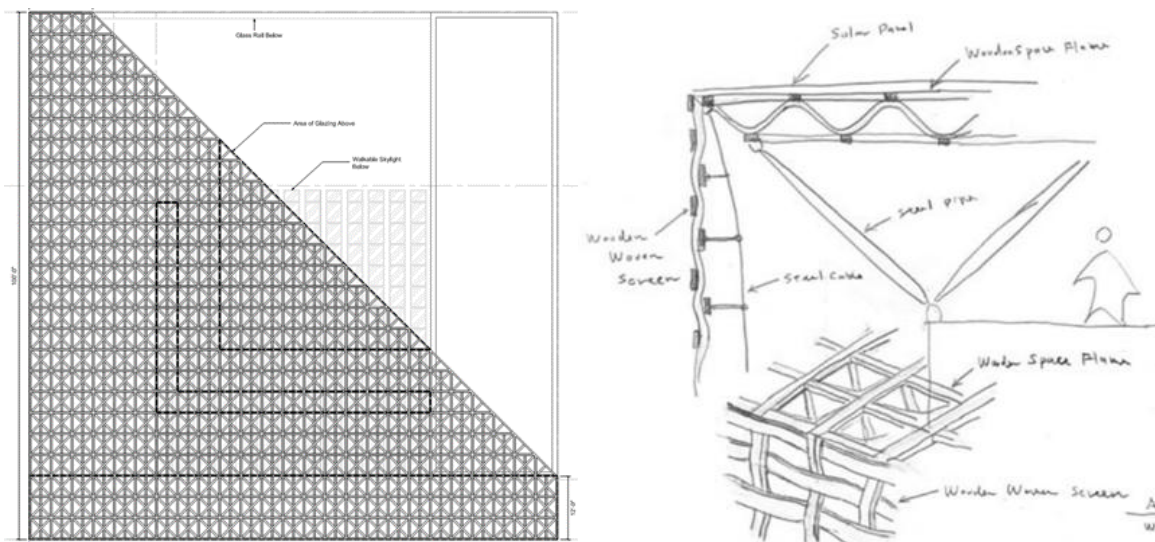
Plan at top of truss and Shigeru Ban's conceptual sketch
